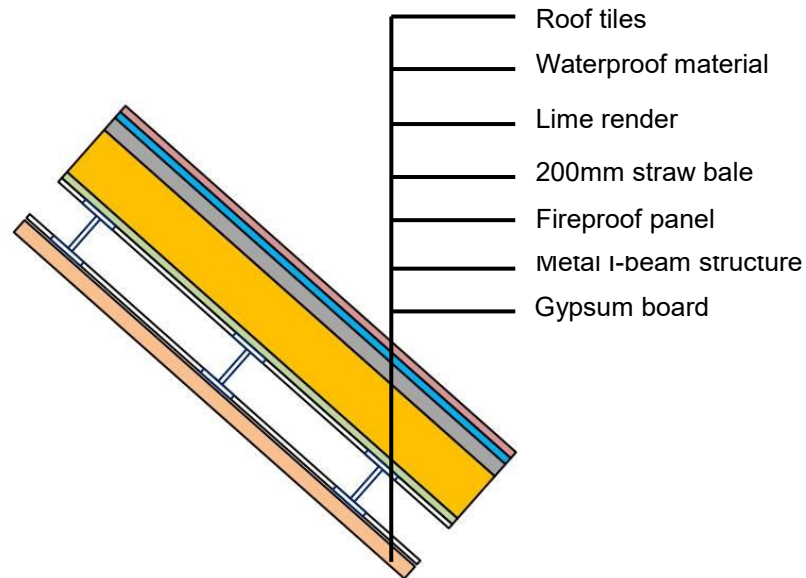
Roofing construction of the steel frame straw bale house. (reproduced from(Cao *et al.*, 2010).
